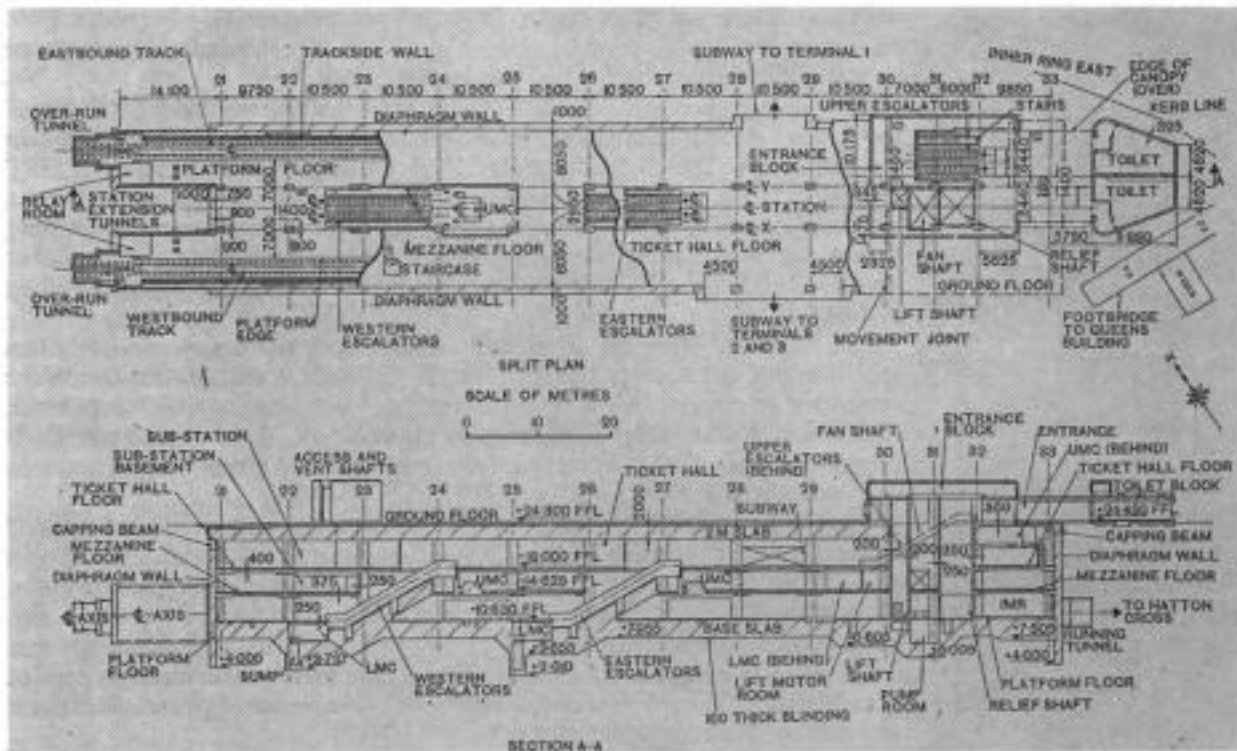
Heathrow Central station, plan and vertical section (Jobling and Lyons¹⁶)
